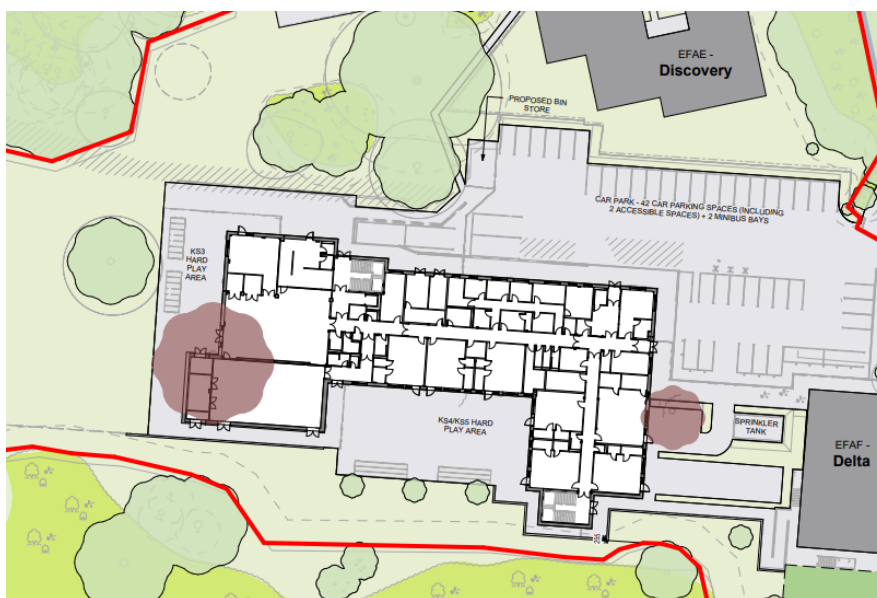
Two trees to be removed, shown in purple above to facilitate the proposed building footprint and hardstanding.
